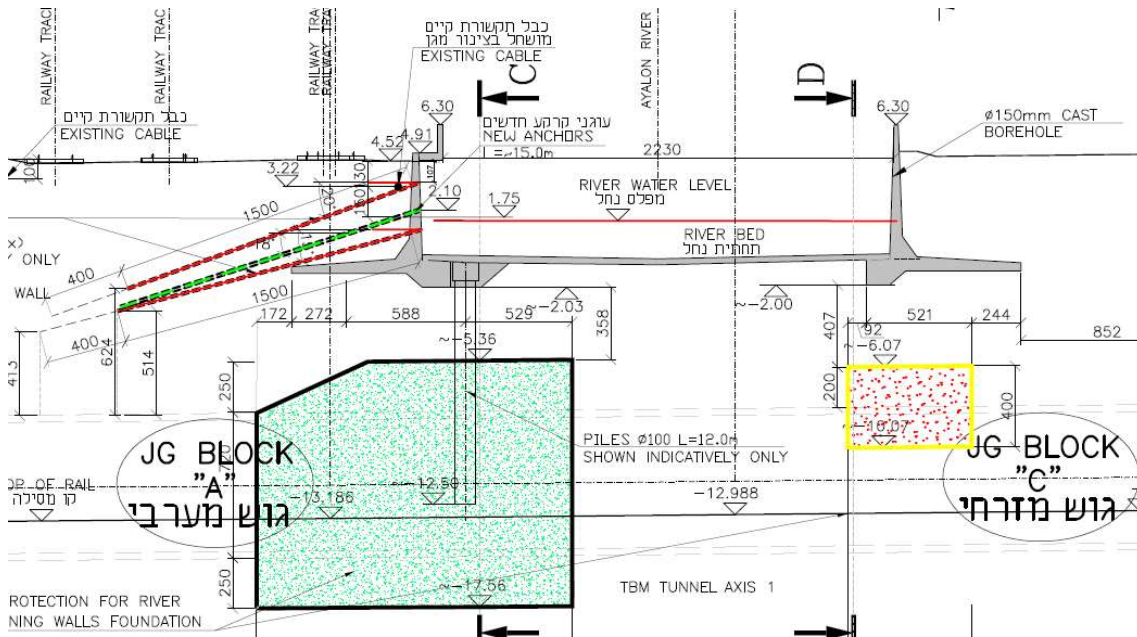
Piles, Ground Anchors and Jet Grouting under the retaining walls.
